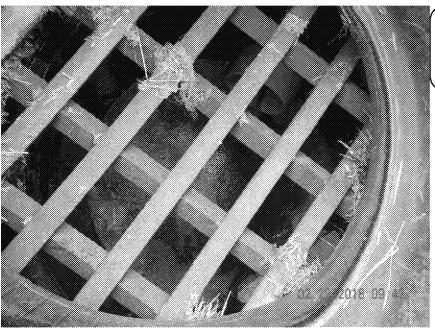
(left). Main Farm— South FSA inside runoff collection manhole.
